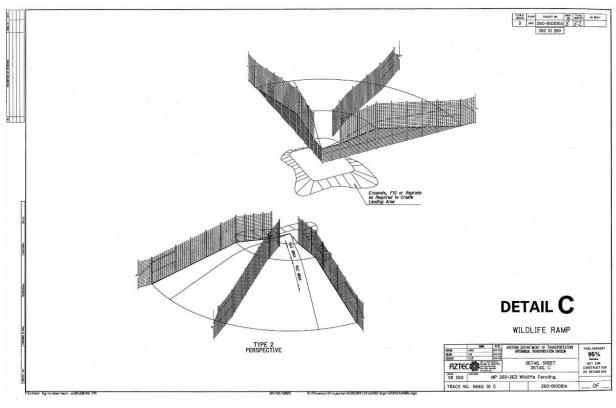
Arizona DOT Wildlife Escape Ramp Fencing
